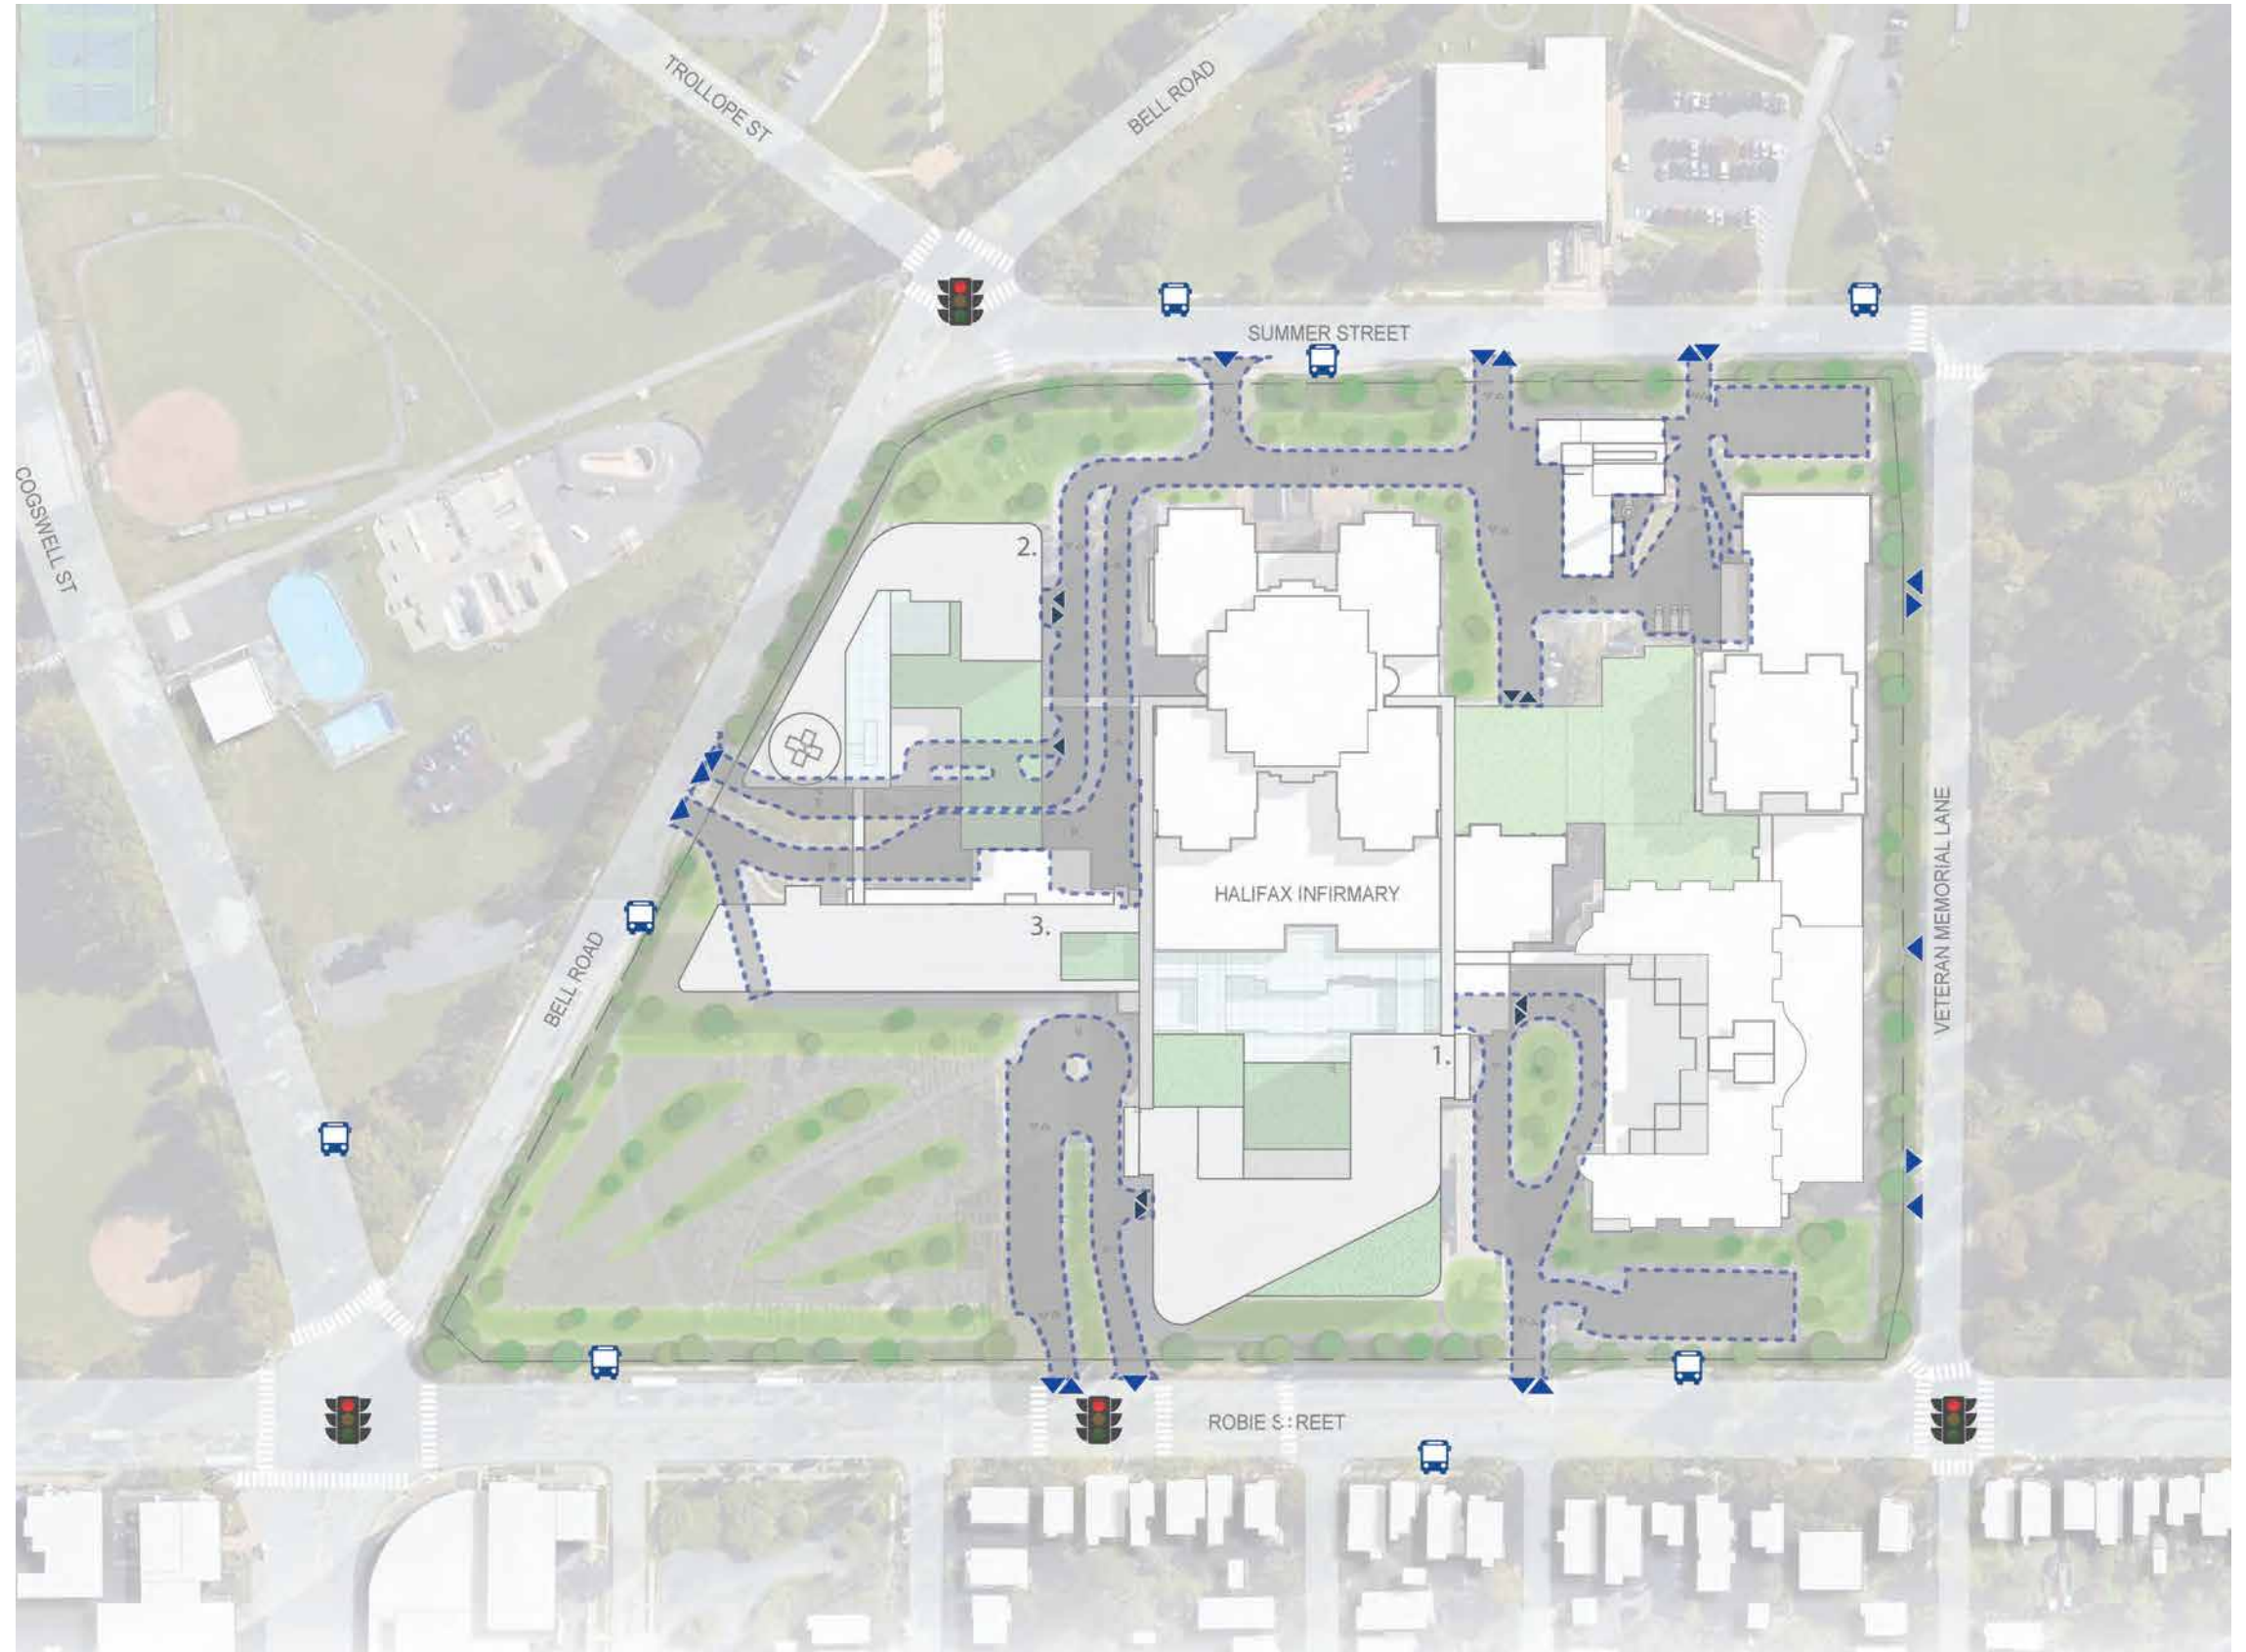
Willow Tree Site Plan - Vehicular Traffic
